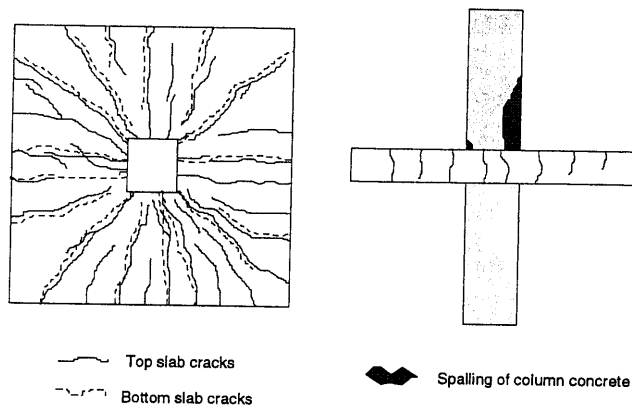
Cracking Pattern: Specimen B-4 (Unloaded Slab)
